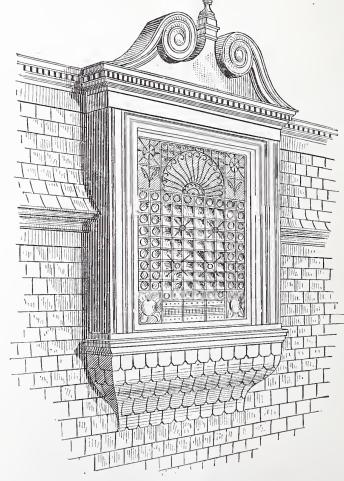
Window Lighting Staircase. (See Front Elevation.)
